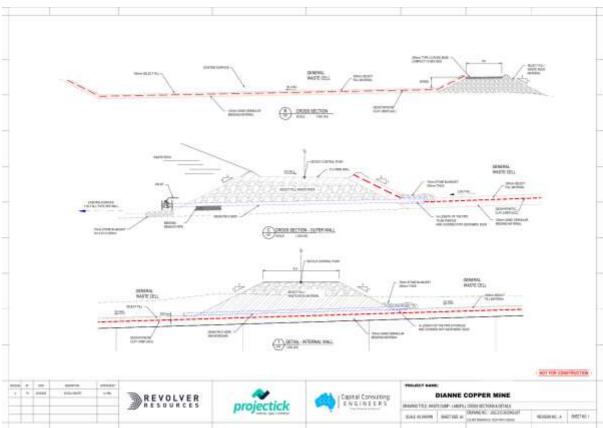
Predicted Landfill Layout - Detailed Cross Section
